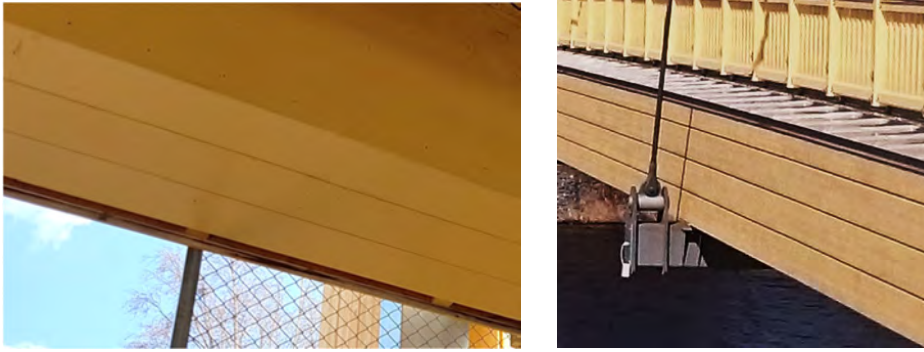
Good design. Left: Painted glulam beam with painted cladding of ventilated horizontal wood panel on vertical battens on the outside. Right: The outside of the cladding and on top of the beam is a ventilated steel plate.
